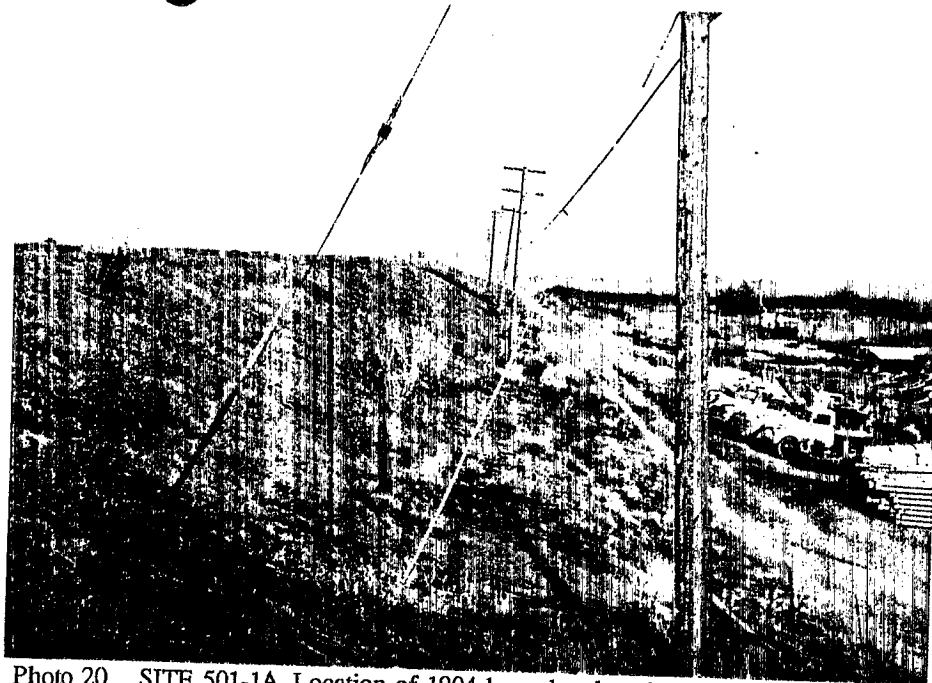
SITE 501-1A Location of 1904 levee break and sand boil on L/S slope in Feb. 1986 12/16/93
